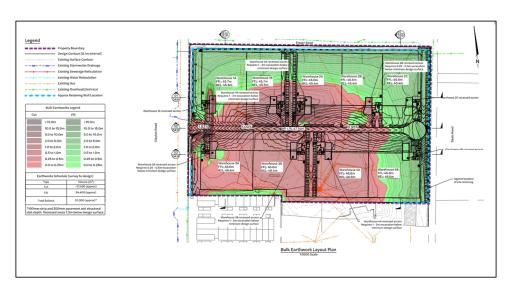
Excerpt of Bulk Earthworks Layout Plan (Source: Engineering Services Report prepared by Context Engineering)
